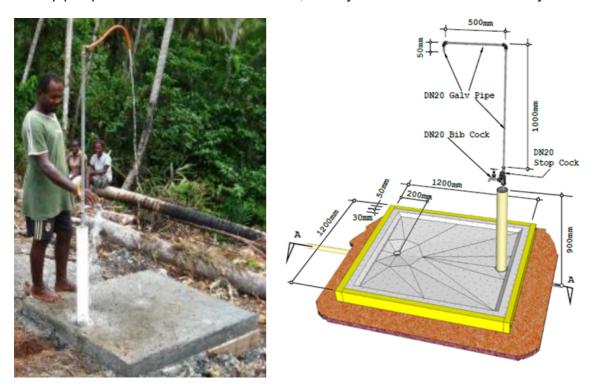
A constructed standpipe in the Solomon Islands (left) and a schematic of a typical standpipe arrangement (right).
